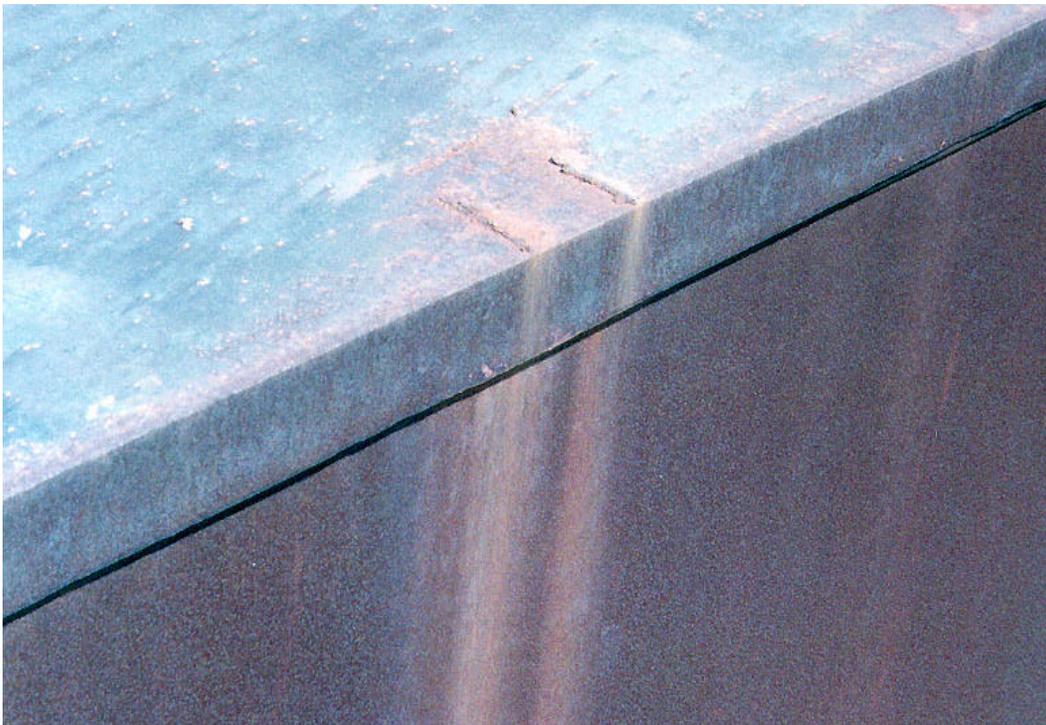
Welds need to be ground out of surrounding surfaces
